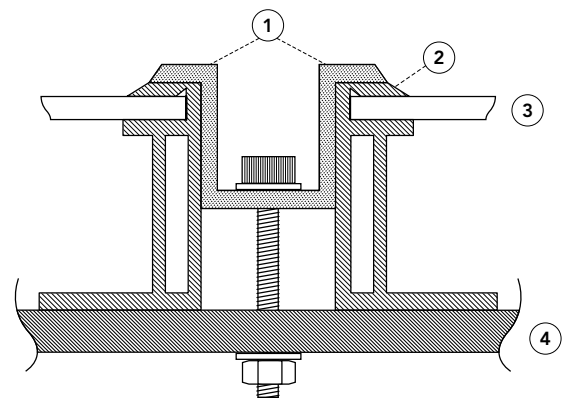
shows an illustrative example of intermediate clamp mounting between modules.
